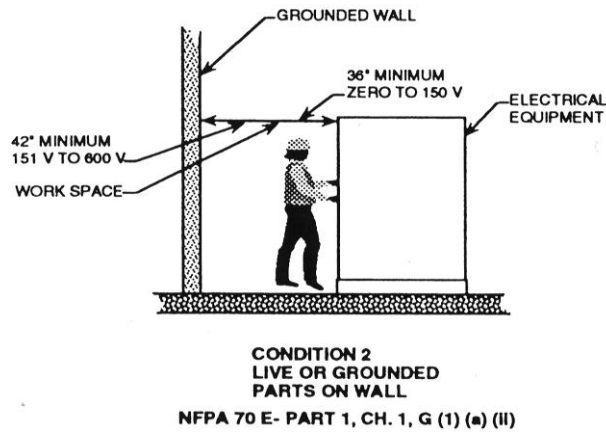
Clearance in front of electrical equipment with grounded wall opposite equipment.
